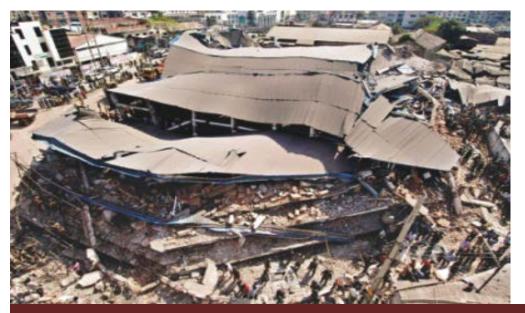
Phoenix garments factory building collapse 2006. Image: Anisur Rahman, courtesy of The Daily Star
